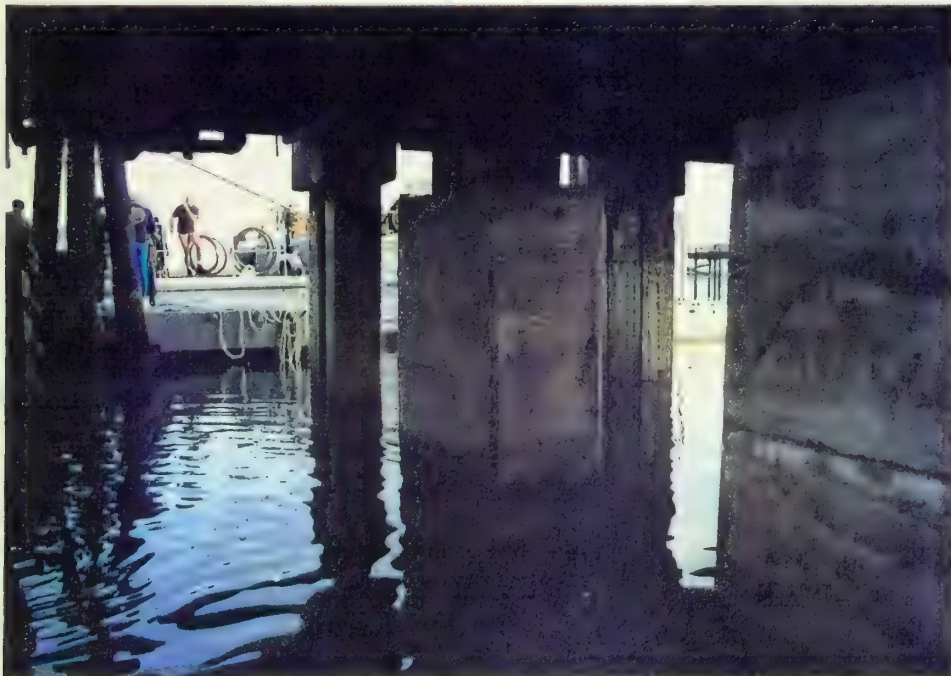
Completed repairs on piles B2 and C2, WWF installed on
